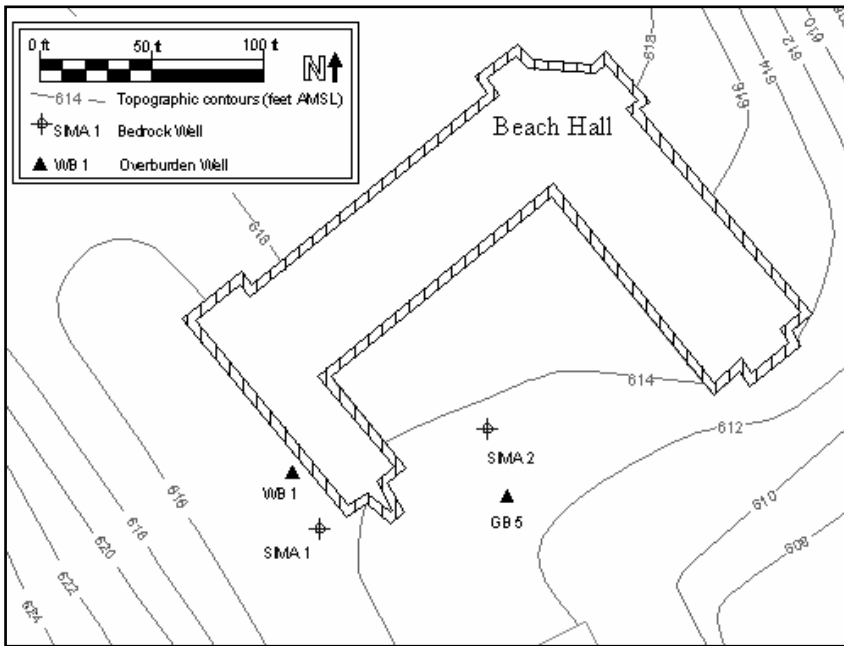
Site Plan depicting the locations of two bedrock and two overburden wells used in the test.
